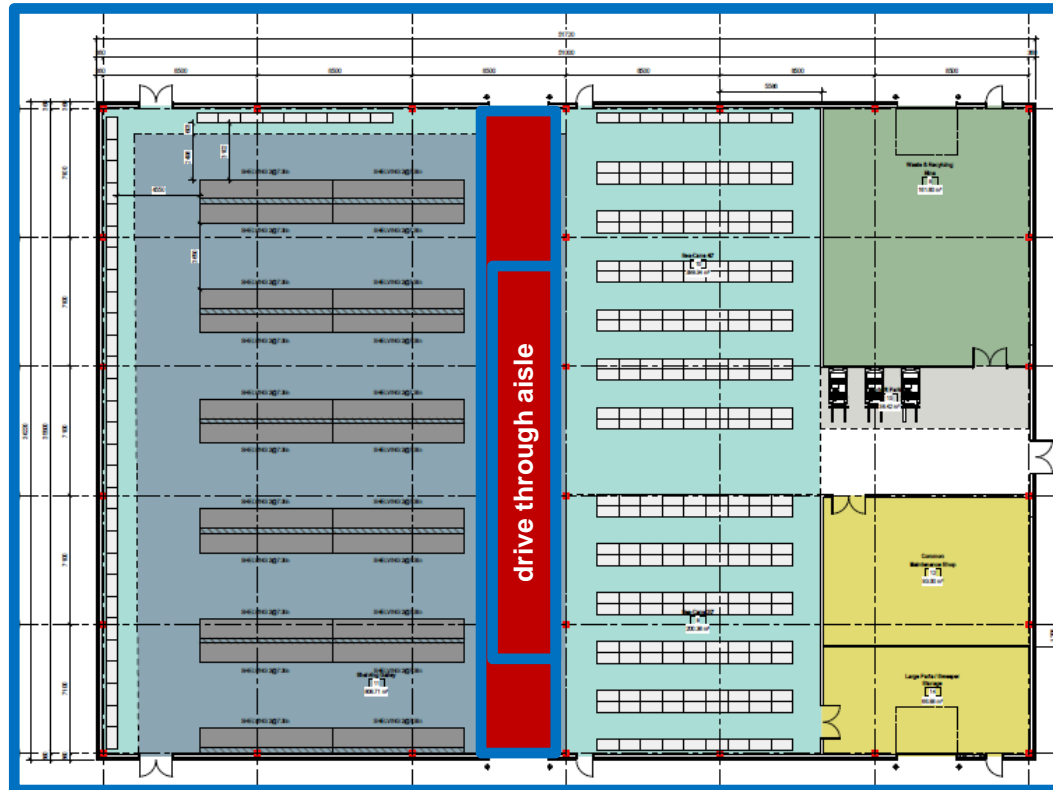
Floor Plan of Purpose-Built Storage Building with drive through aisle
